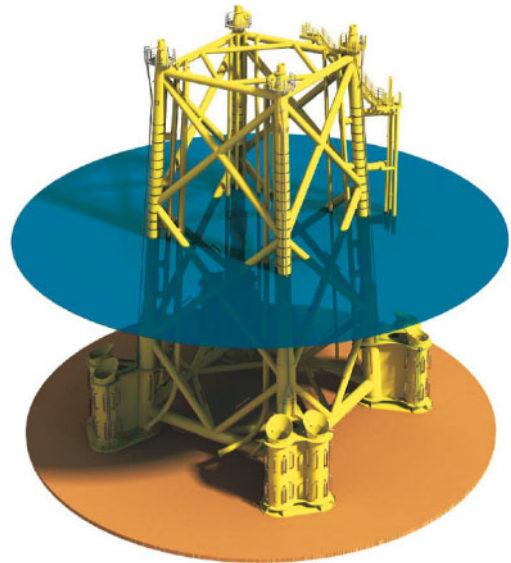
General scheme of eight-pile Borkum Riffgrund Transformer Substation jacket structure.
